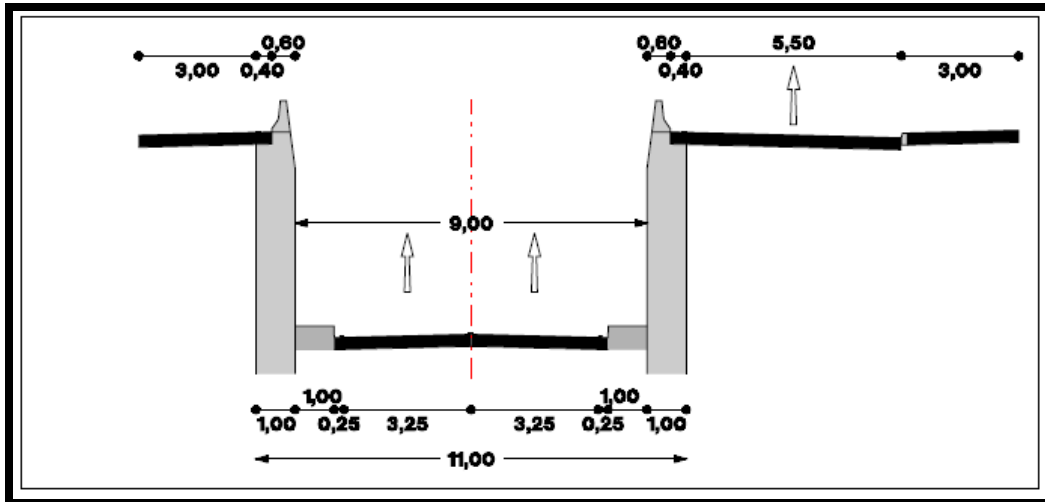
Mack Nimir Tunnel (Open cross section)
